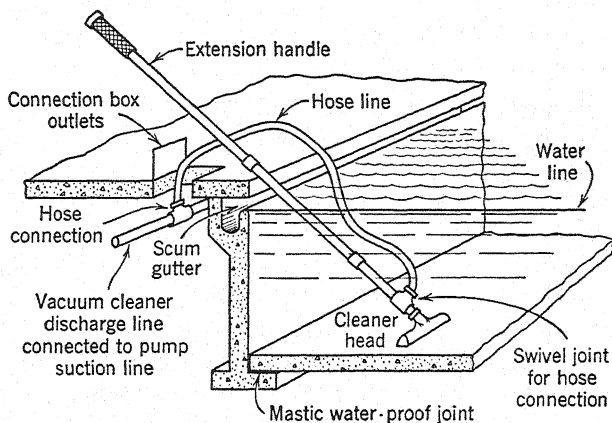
Pool wall and floor section, showing vacuum-cleaner arrangement.
